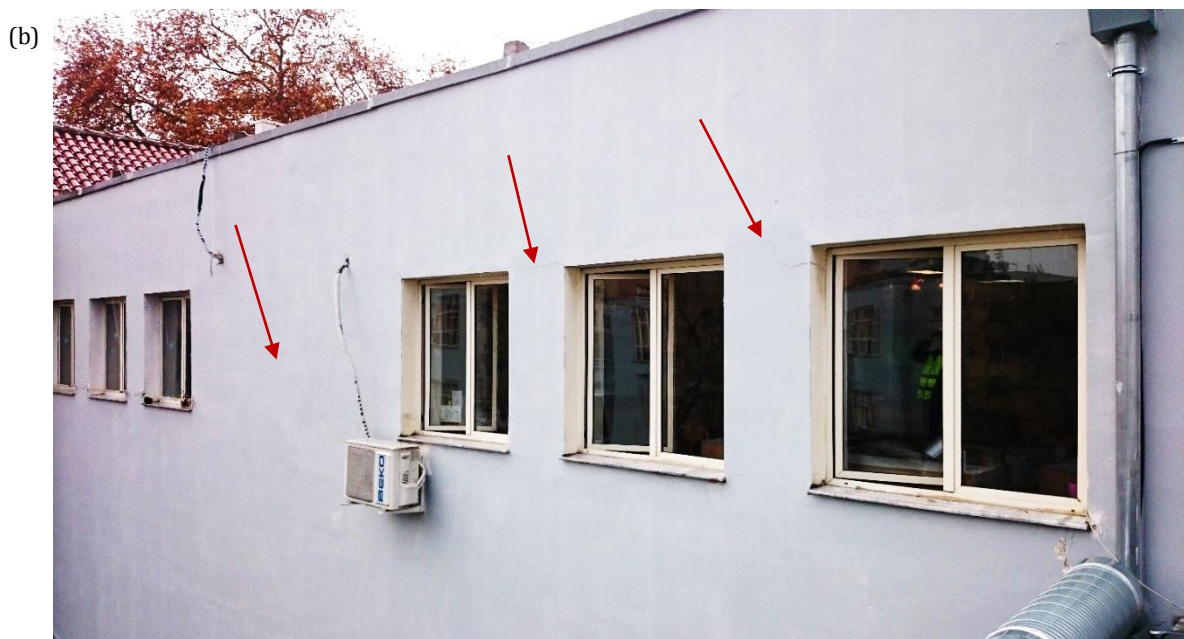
a) A beam casted on spandrel over a window in the last floor of Block B and caused serious damage; b) Diagonal shear cracks on outer façade of the last story. This damage patterns also continue in the inner part.
